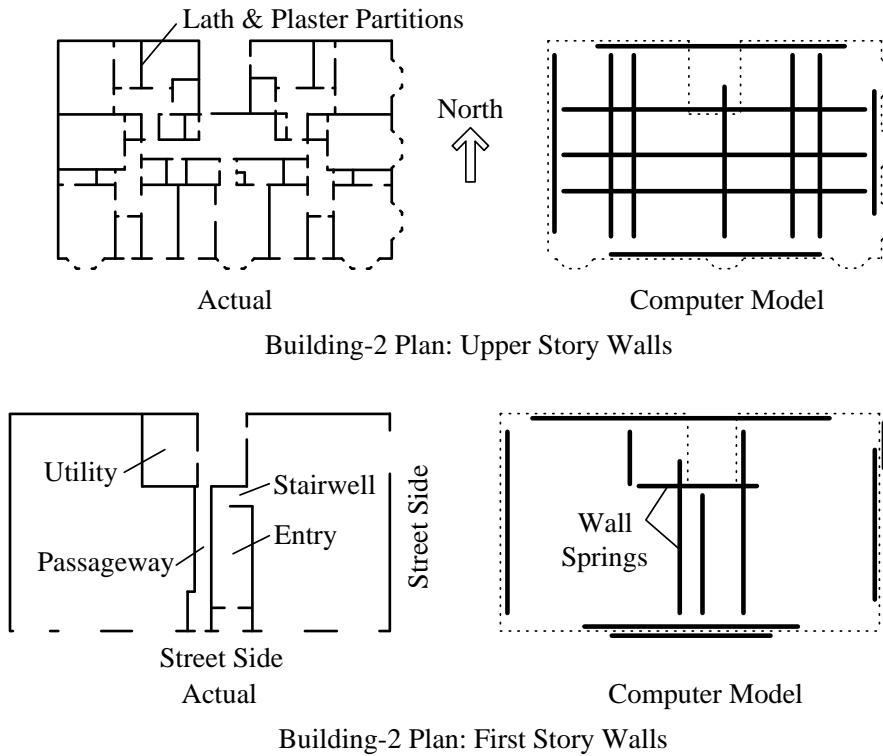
Marina District corner building typical geometry. The longitudinal direction is usually oriented in the EW direction.
